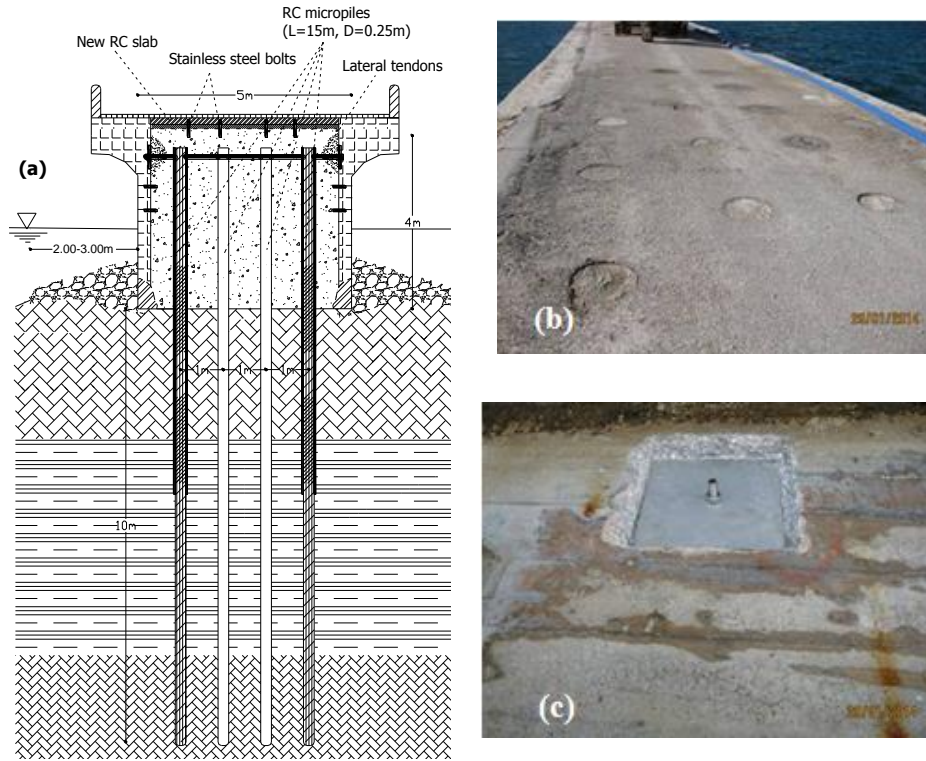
(a) Typical cross-section of the bridge in the transverse direction showing the proposed intervention measures (b) Group of micropiles embedded from the bridge deck (c) Steel plate embedded in the façades of the bridge anchoring the lateral tendons.
